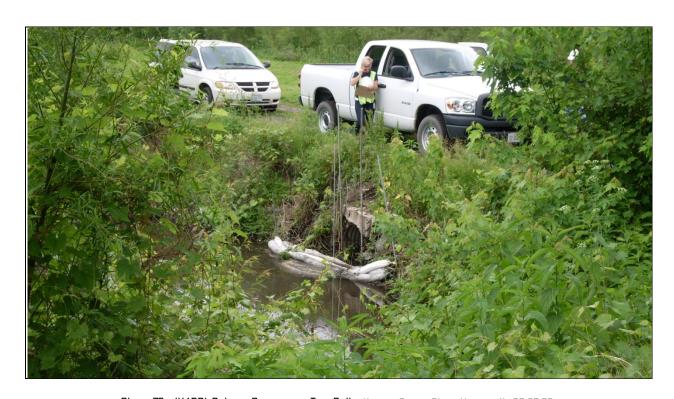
(NAPS) Culvert Connecting Two Cells, Havana Power Plant, Havana, IL, 05.27.09
